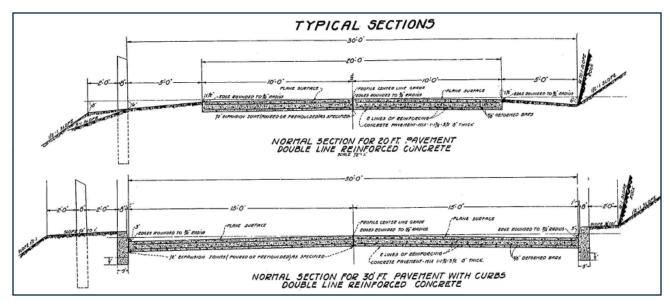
Typical 20 foot and 30 foot wide cartway sections.
